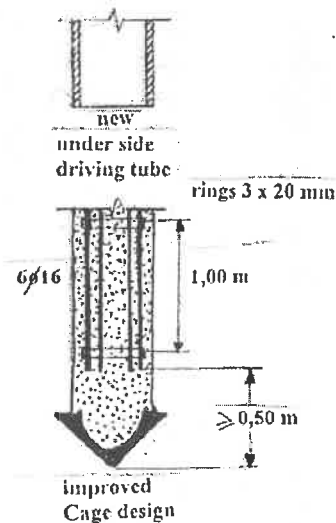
Adapted design of reinforcement cage. Spiral has been replaced by rings at a 1,00 m spacing. Mounting by means of welding only.
